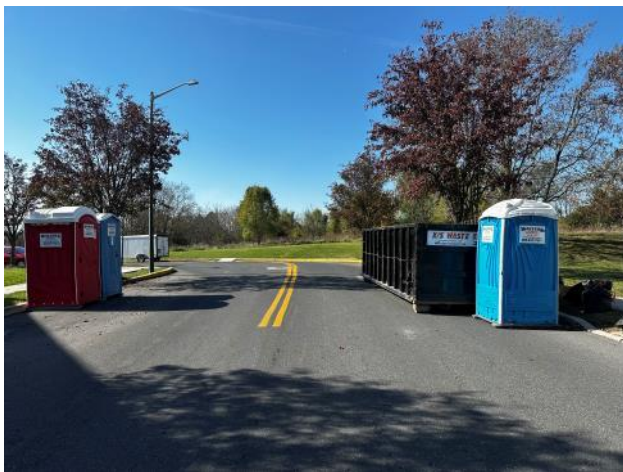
Overview of portable toilets and a dumpster on Courtyard Drive.
